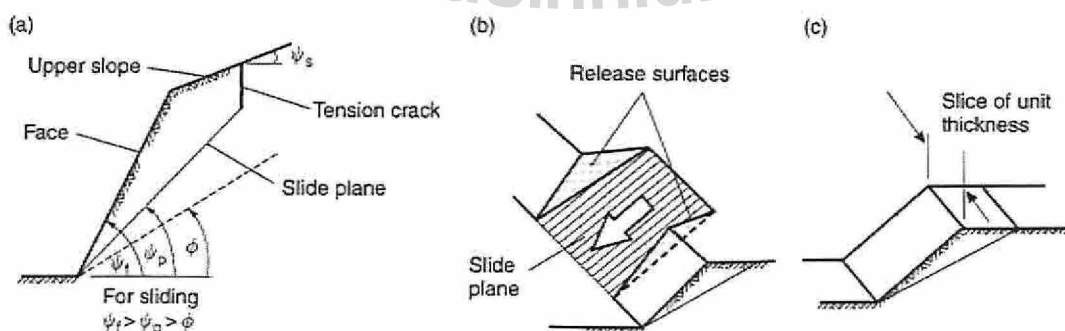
Geometry of slope exhibiting plane failure: (a) cross-section showing planes forming a plane failure; (b) release surfaces at ends of plane failure; (c) unit thickness slice used in stability analysis.
